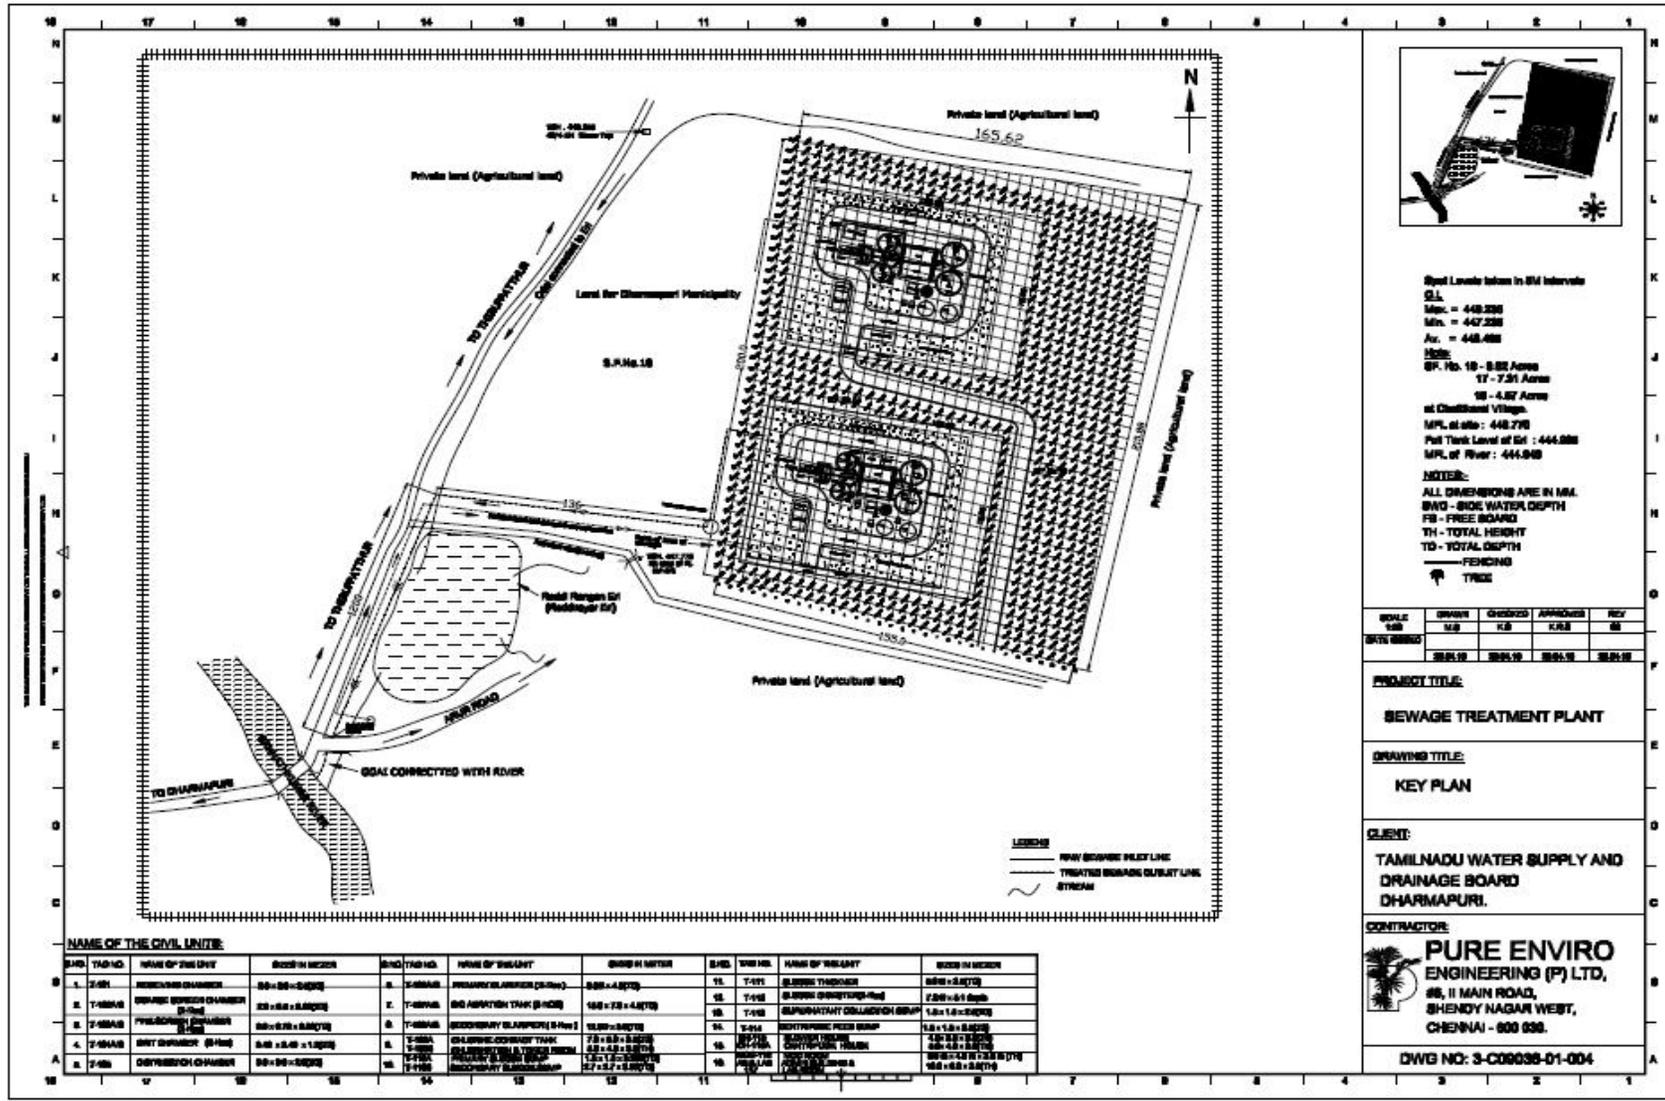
Layout Showing Disposal Point, Existing and Proposed Plan of the STP.
